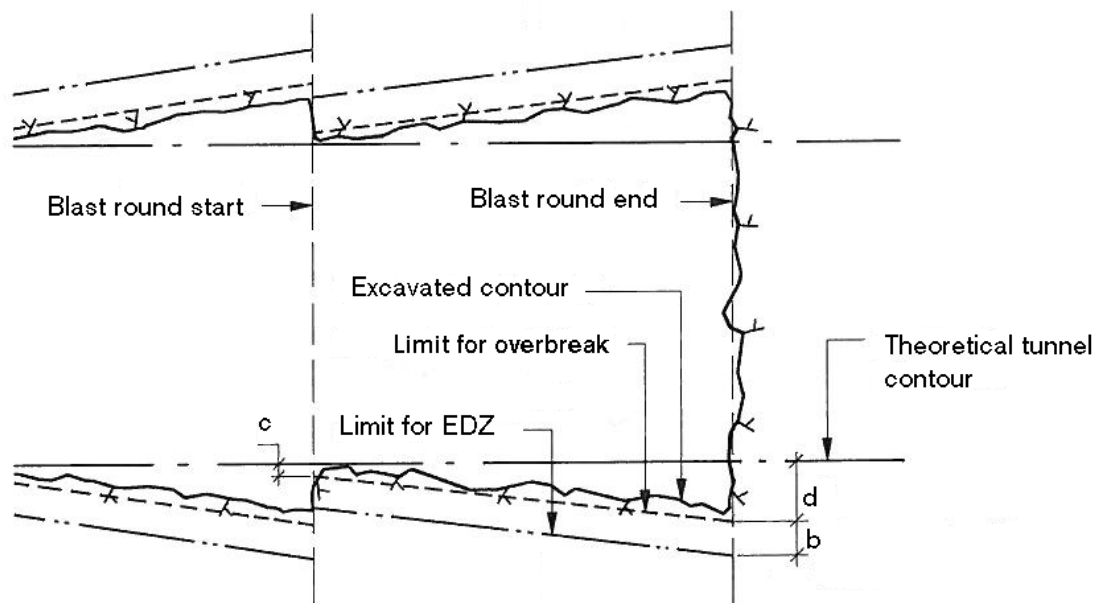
Plan of a tunnel section excavated with drill and blast technique / AB Svensk byggtjänst, 1998/ (modified).
